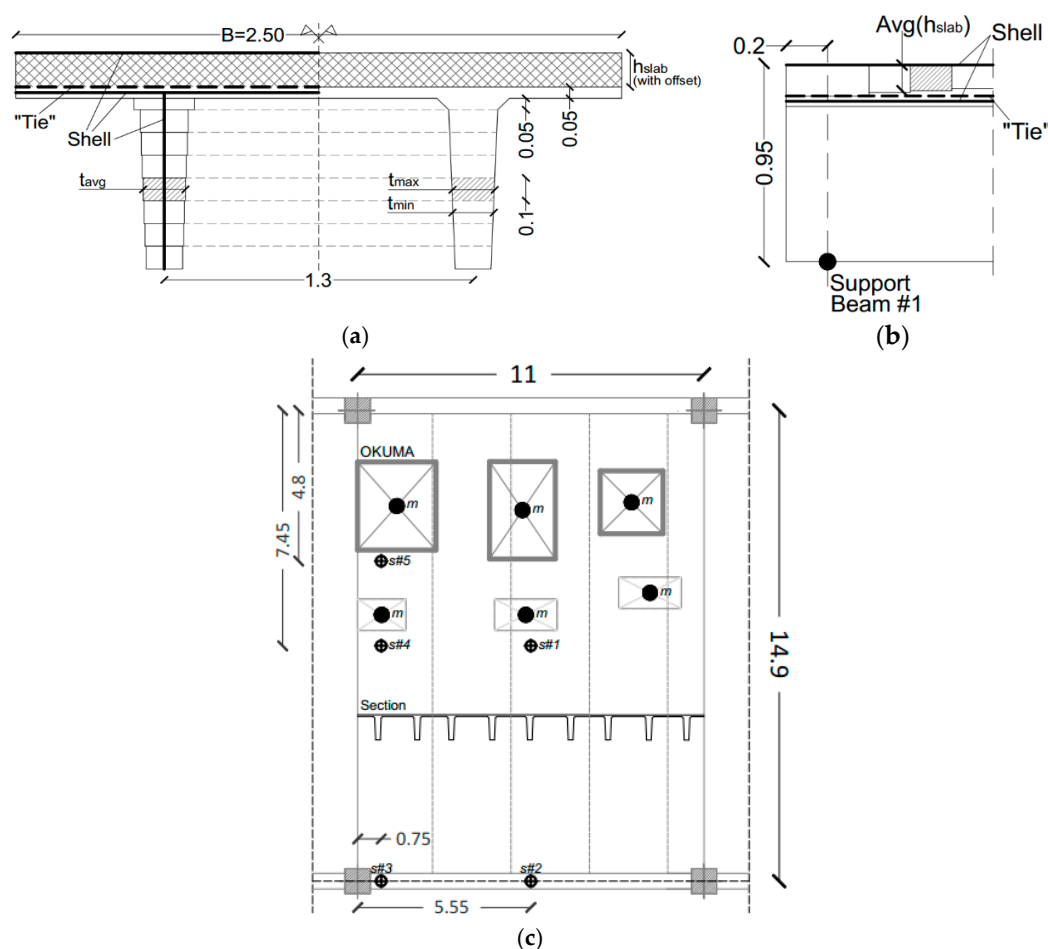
Modelling of the modular elements: (a) cross-section (example for $B = 2.5$ m) and (b) side view, with (c) final layout of the assembled floor region (plan view). All dimensions in m.
